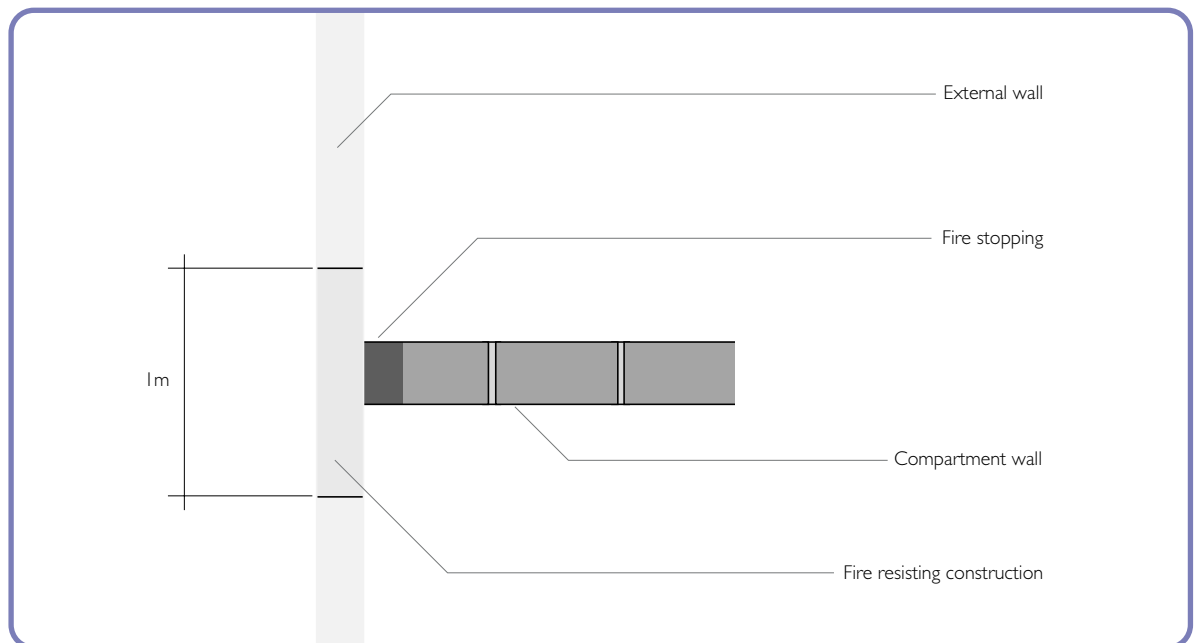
Plan of junction between compartment wall and external wall showing 1m strip of fire resisting construction
